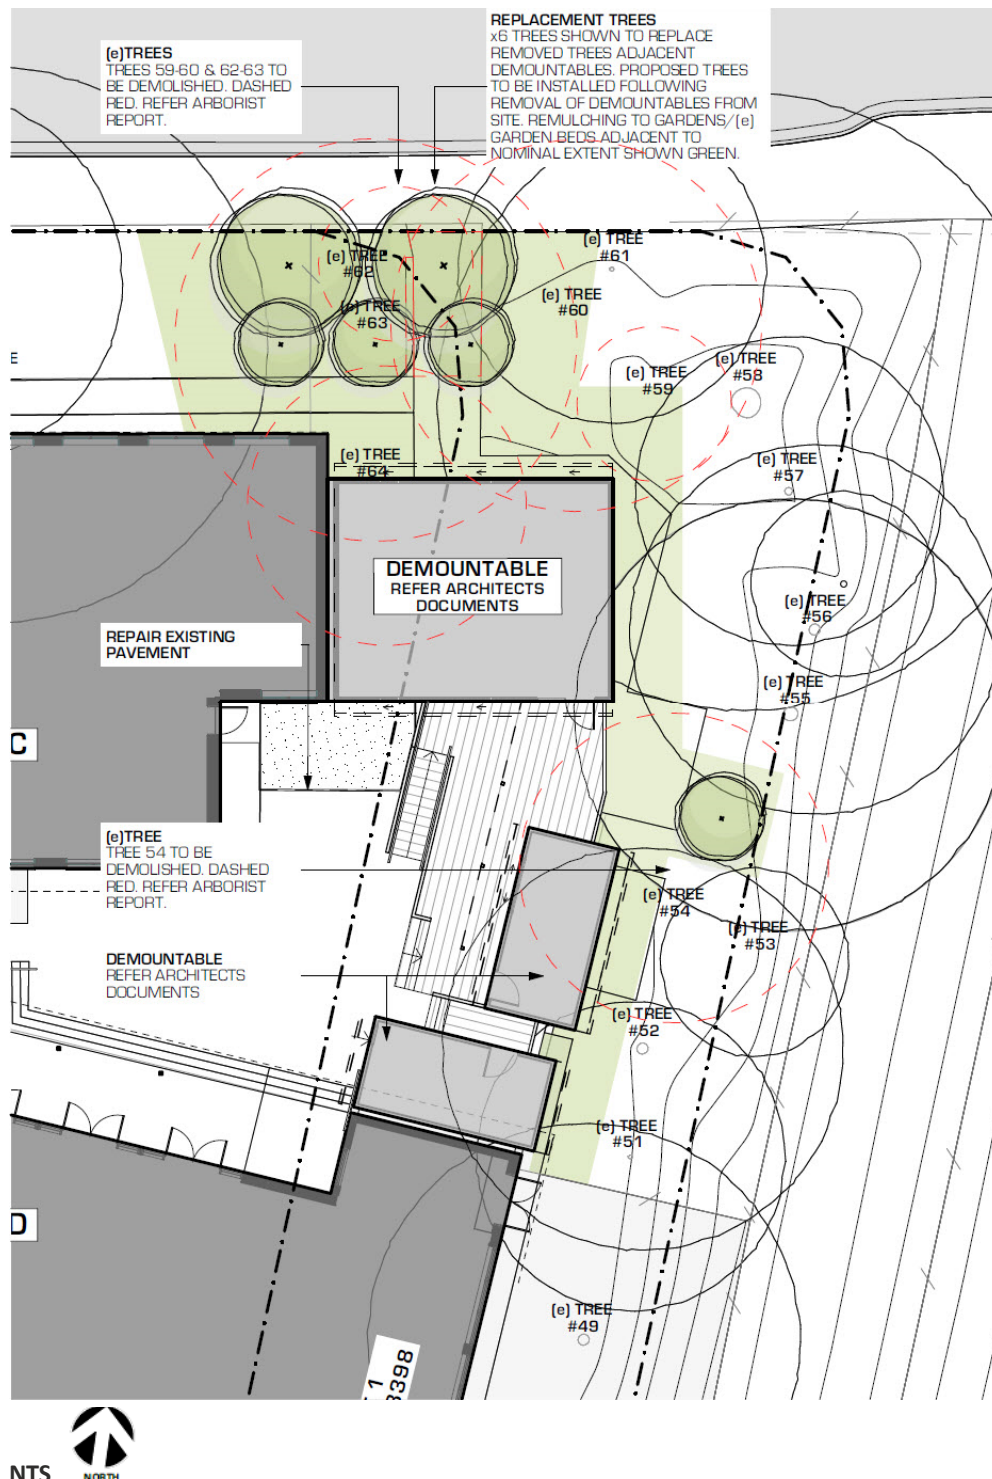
Landscape Plan: West (Source: OHD Landscape Architects, DA2801)
